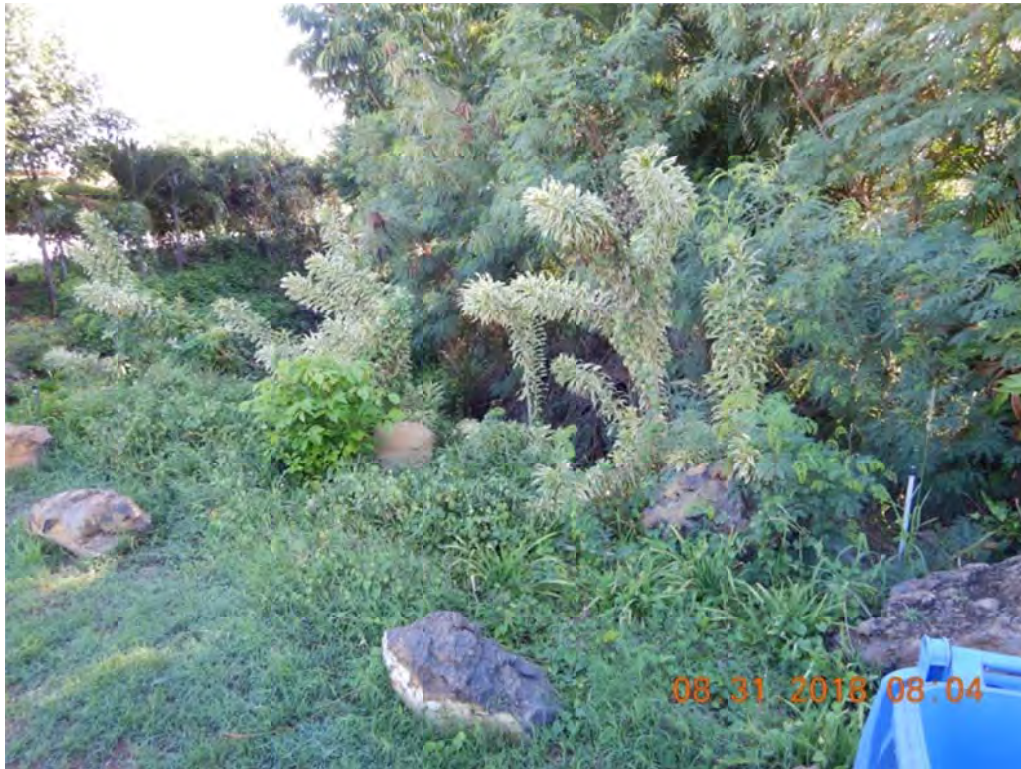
Stand on Akala Dr., look toward upstream of Culvert 36
